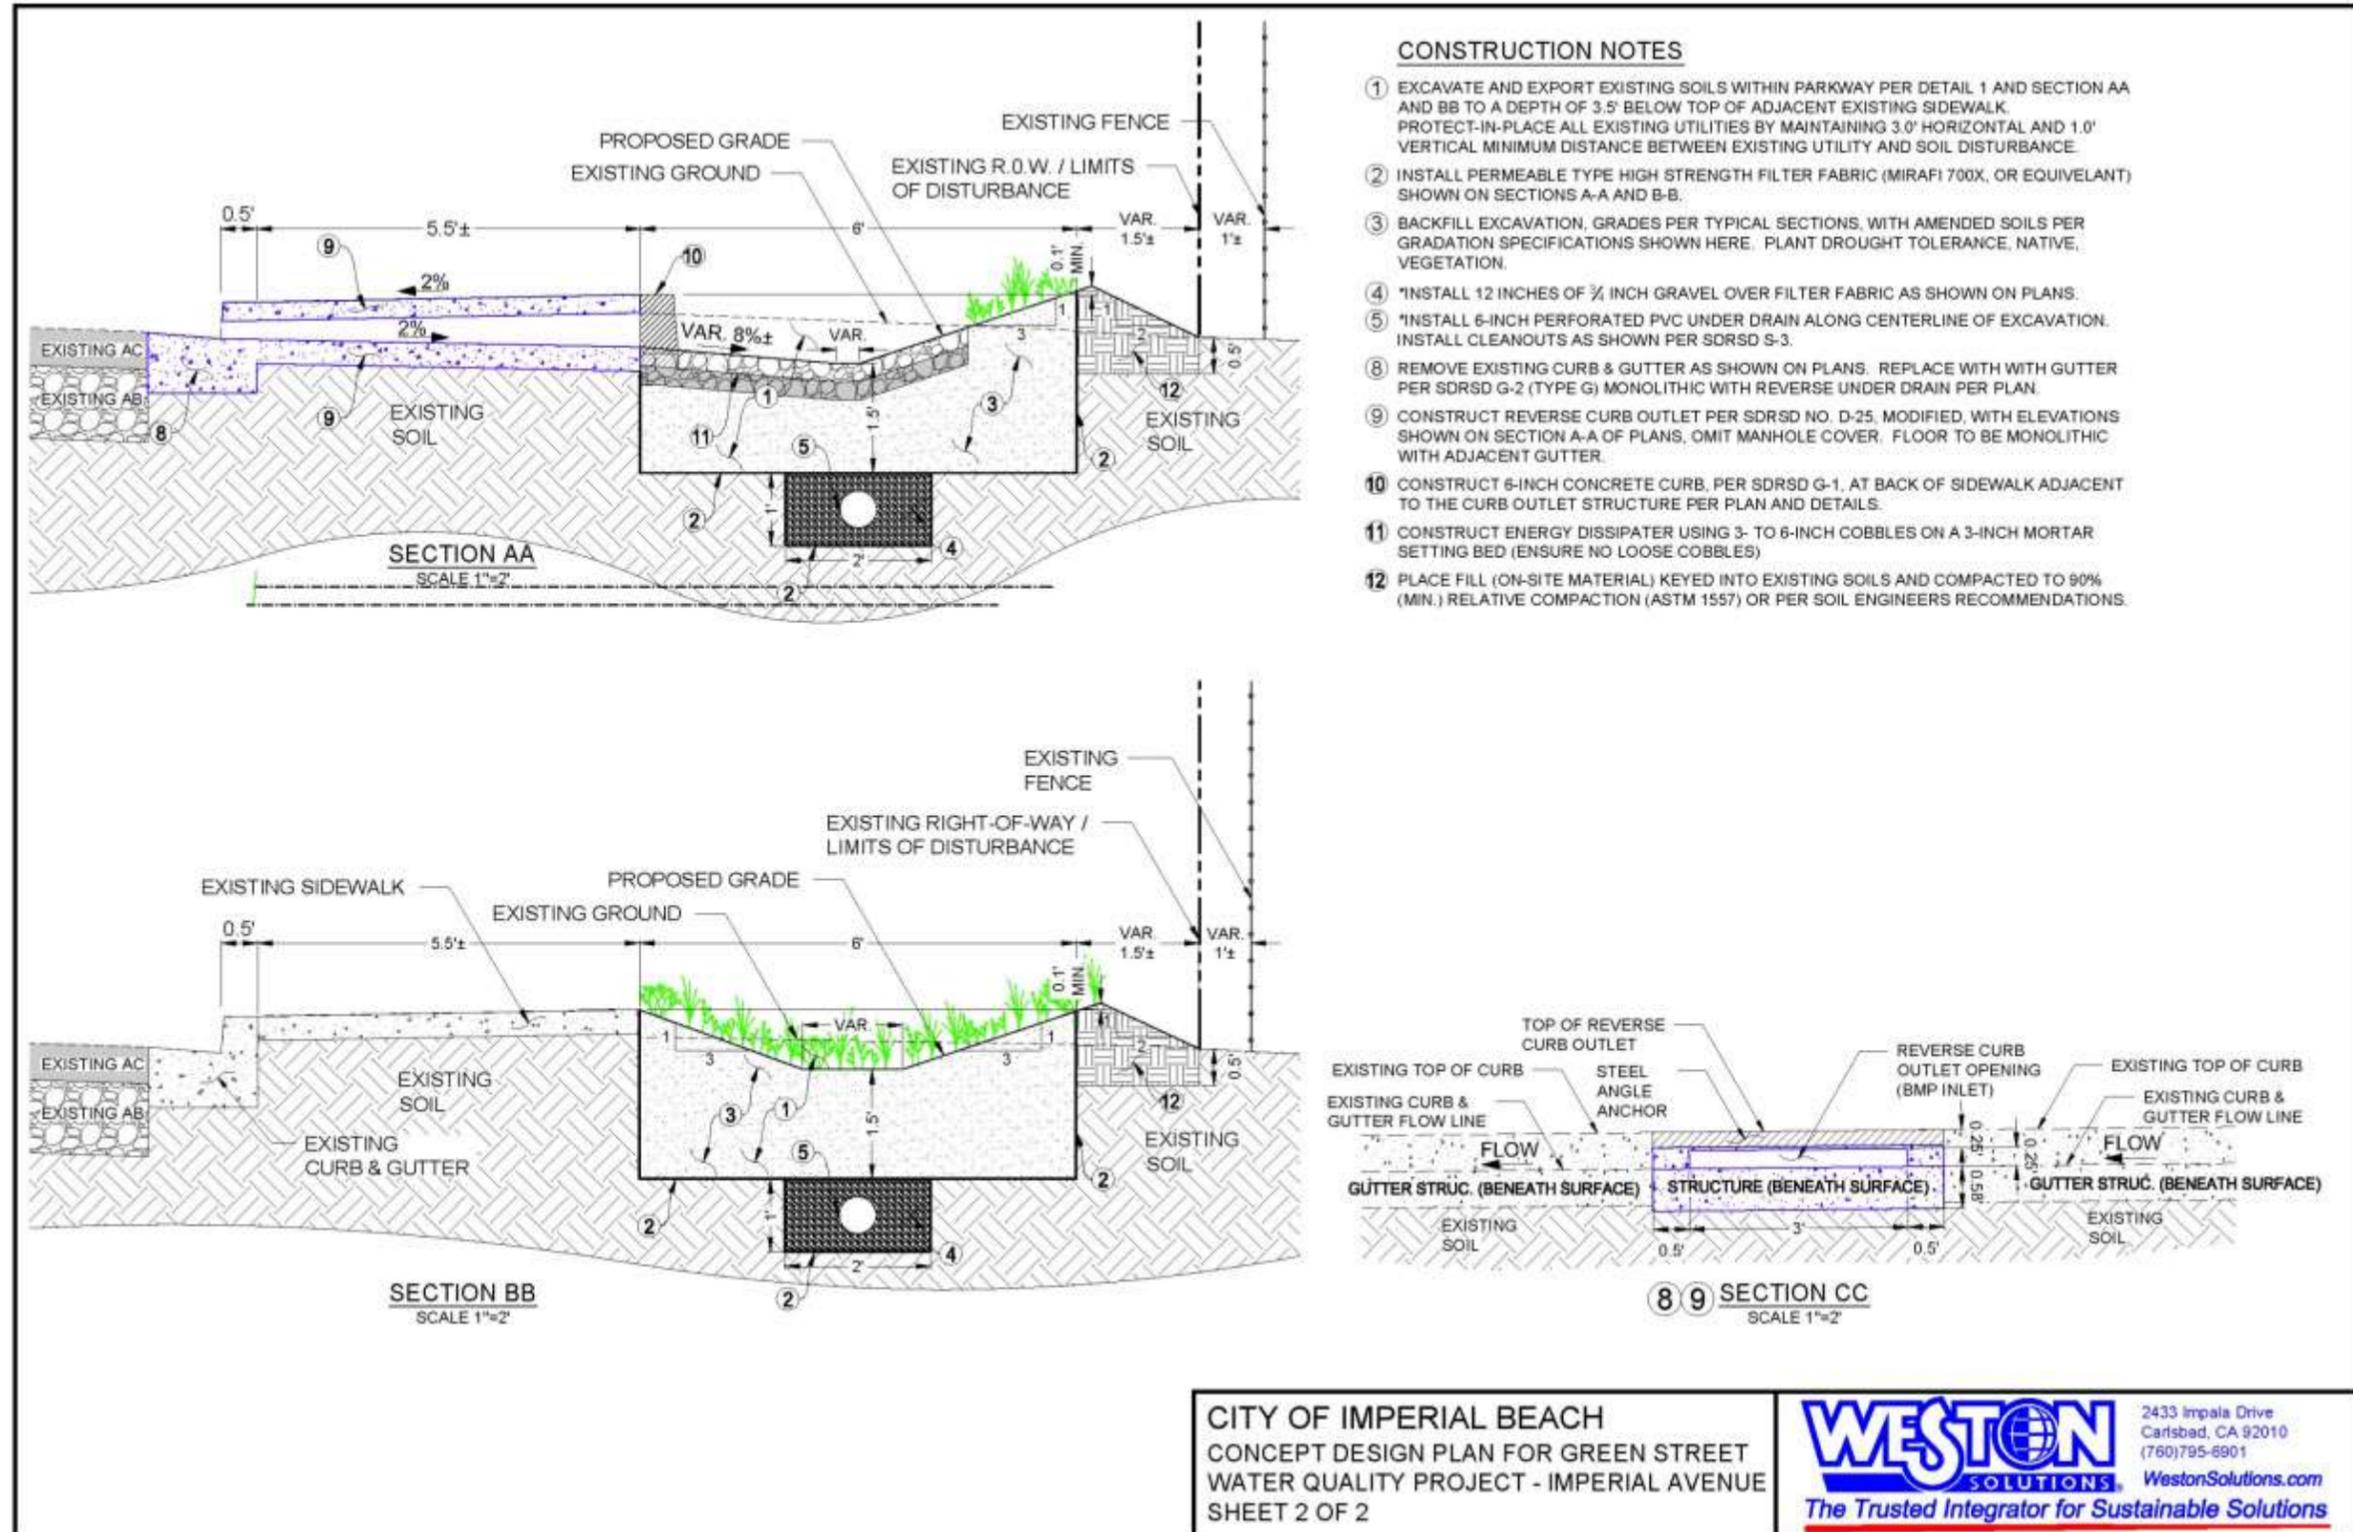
Imperial Beach Boulevard Parkway Bioretention Basins Concept Design Plan (2 of 2)
